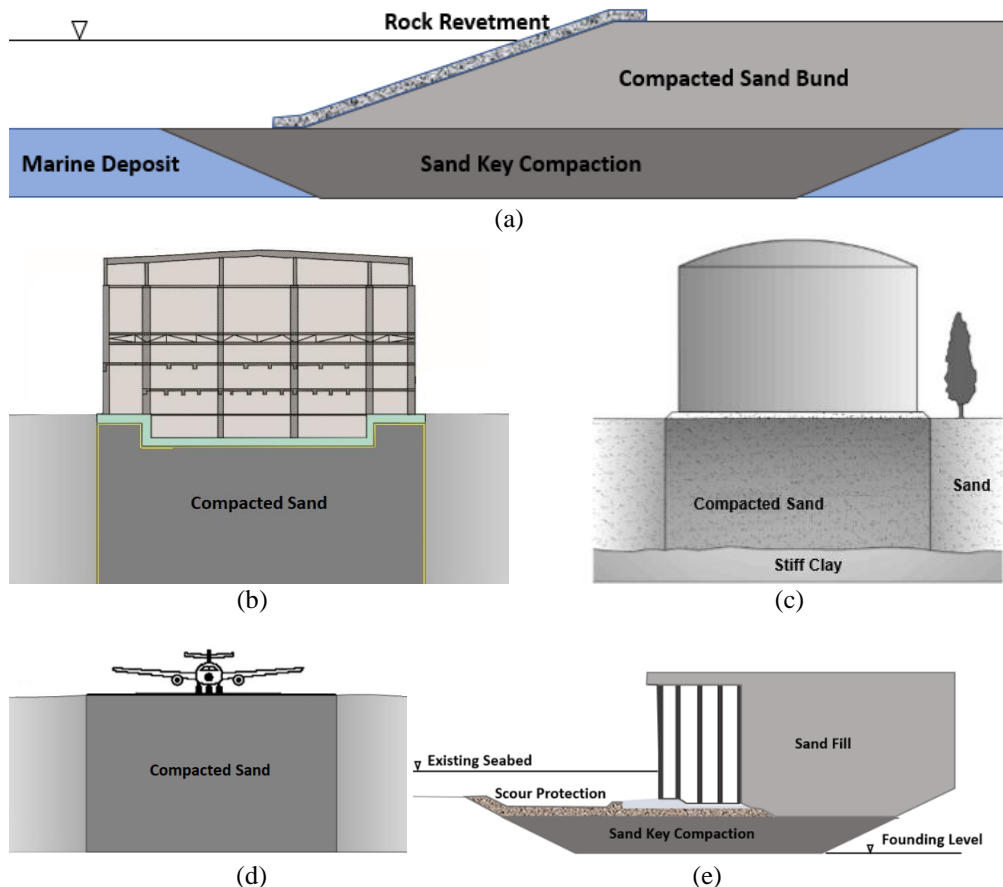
Application of densification techniques in (a) Stability of sand bunds, (b) foundation for large workshops, (c) foundations for storage tanks, (d) foundation for Airport Runways, (e) sand key compaction for caissons, (modified after Raju, 2009; Leong et al. 2012, He et al. 2016; Daramalinggam et al. 2009; Raju and Sondermann, 2005)
